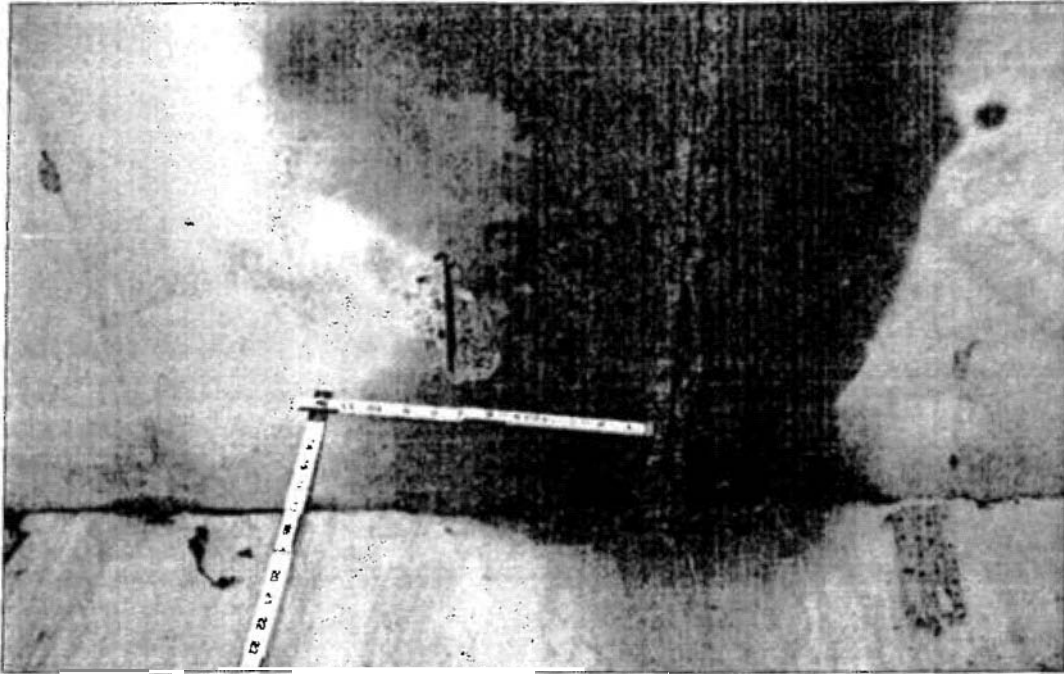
Element 38 - Typical Slab Underside Spall with Exposed Rebar
